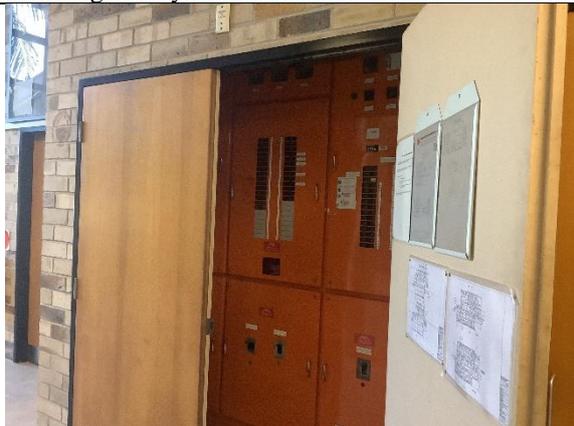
Building G – G.G.26 – Electrical Distribution Board – Compressed Bituminous Electrical Panel
